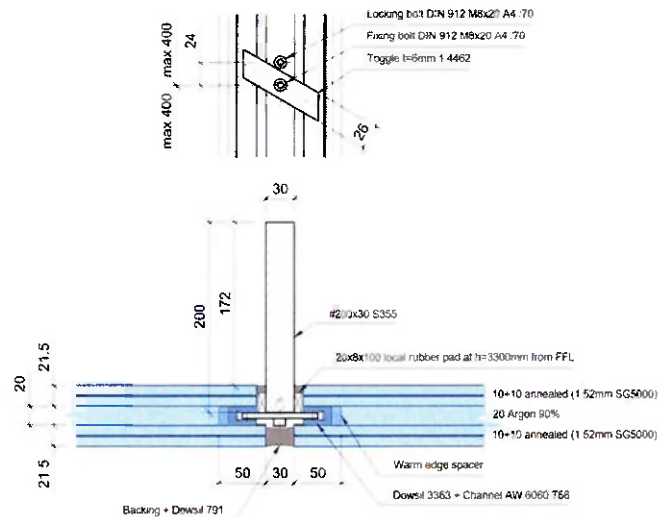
EWS-600 Plan detail of glass to glass joint with steel fin
